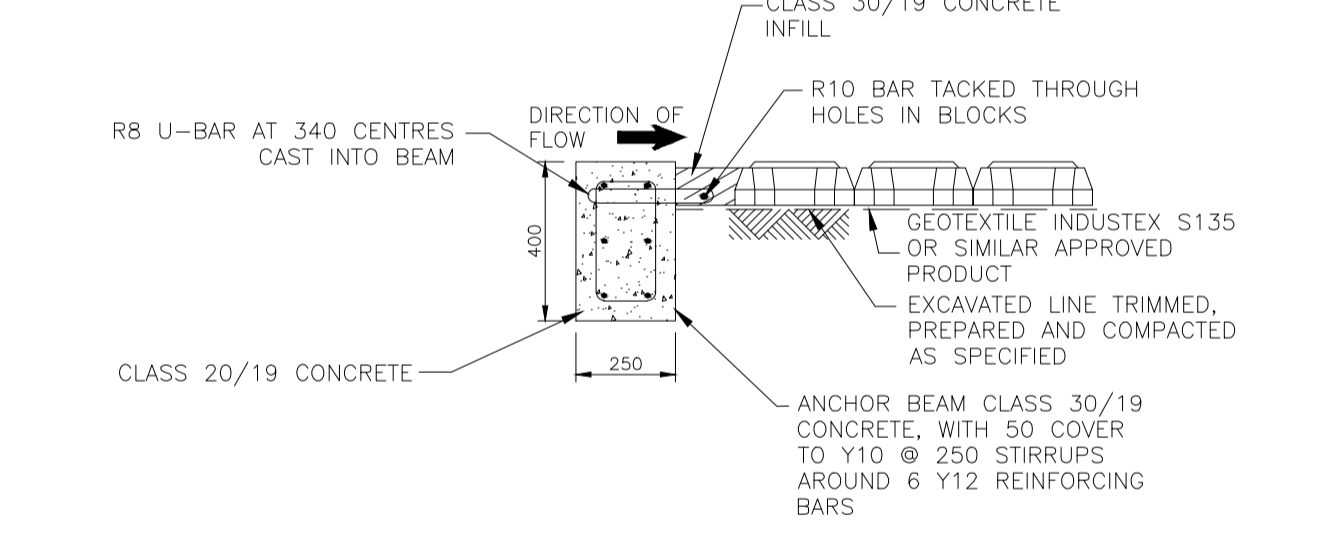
DETAIL FOR CONNECTION TO CULVERT OUTLET STRUCTURE
